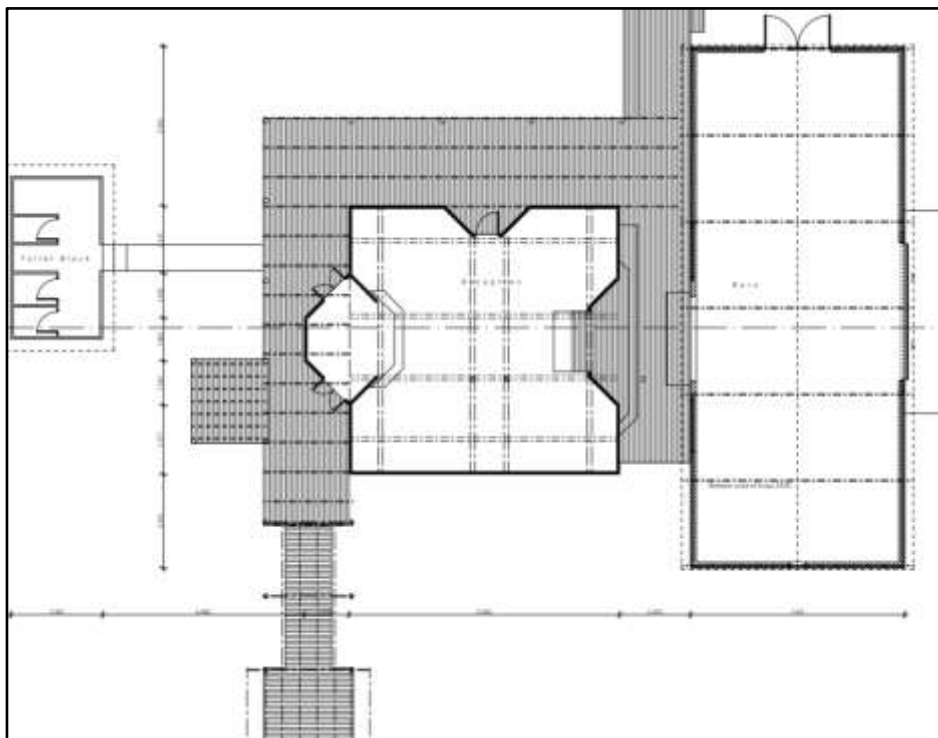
Architectural Plans (Source: Spooner Architectural Solutions).
